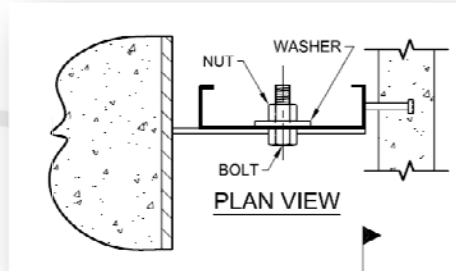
Modified Precast Structural Connection Detail (www.slenderwall.com)
